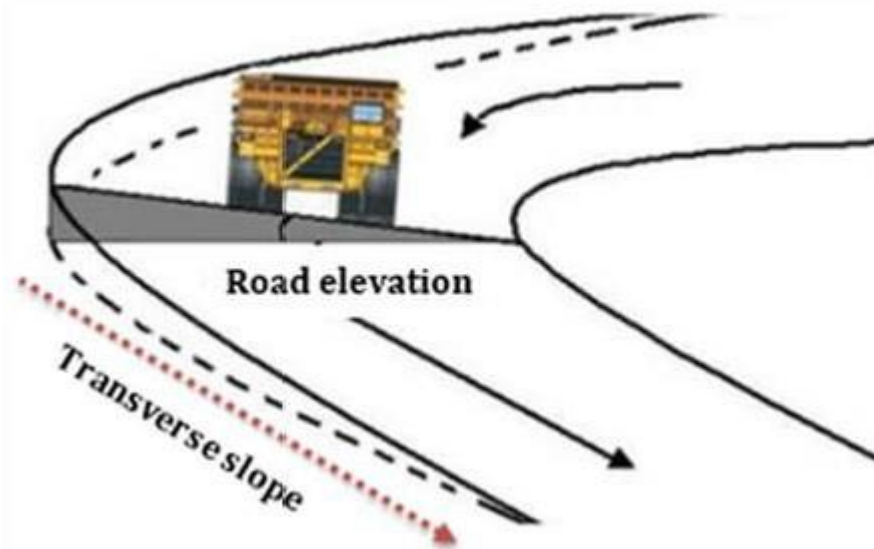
Scheme of the road elevation and transverse slope of road [11].
